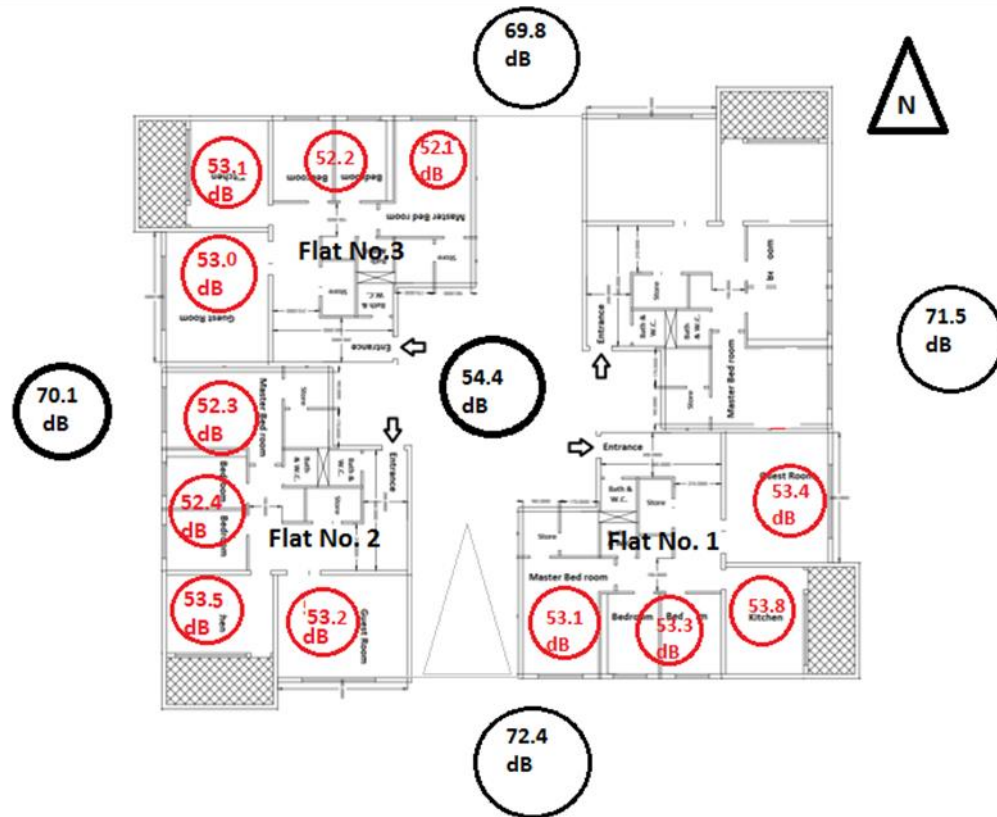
The dB level inside and outside of the First case study buildings- MRF Towers. The dB level measurement demonstrated that the rooms that face the 100-meter street, are getting more noise than other parts. While the measurements demonstrated that the master bedrooms are the quietest rooms in all the buildings, and the reason is that they are not containing many devices such as a TV, and have fewer activities than other parts. Other small bedrooms are noisier than the master bedroom because they are adjacent to Kitchen. The results demonstrate that the noise level, is high inside bedrooms, and guest rooms, and acceptable for kitchens inside residential buildings dB which is acceptable up to 55 dB as per international standards, (WHO, 1999). See Table '4'.
